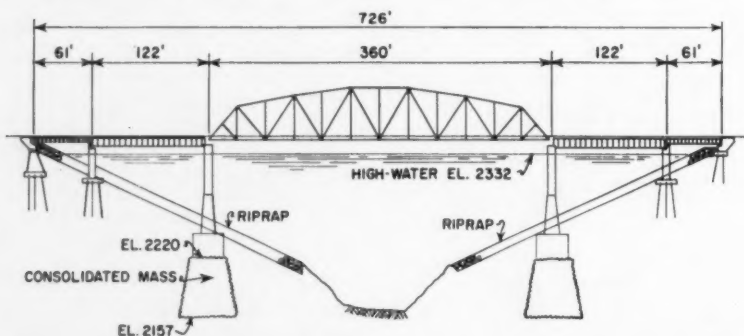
Piers for the 360-ft span of railway bridge No. 57 rest on a subbase consolidated by grout intrusion.
